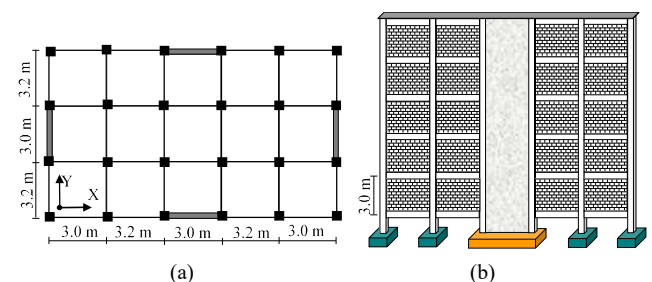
Details of buildings considered in the analysis: (a) plan (b) elevation.
